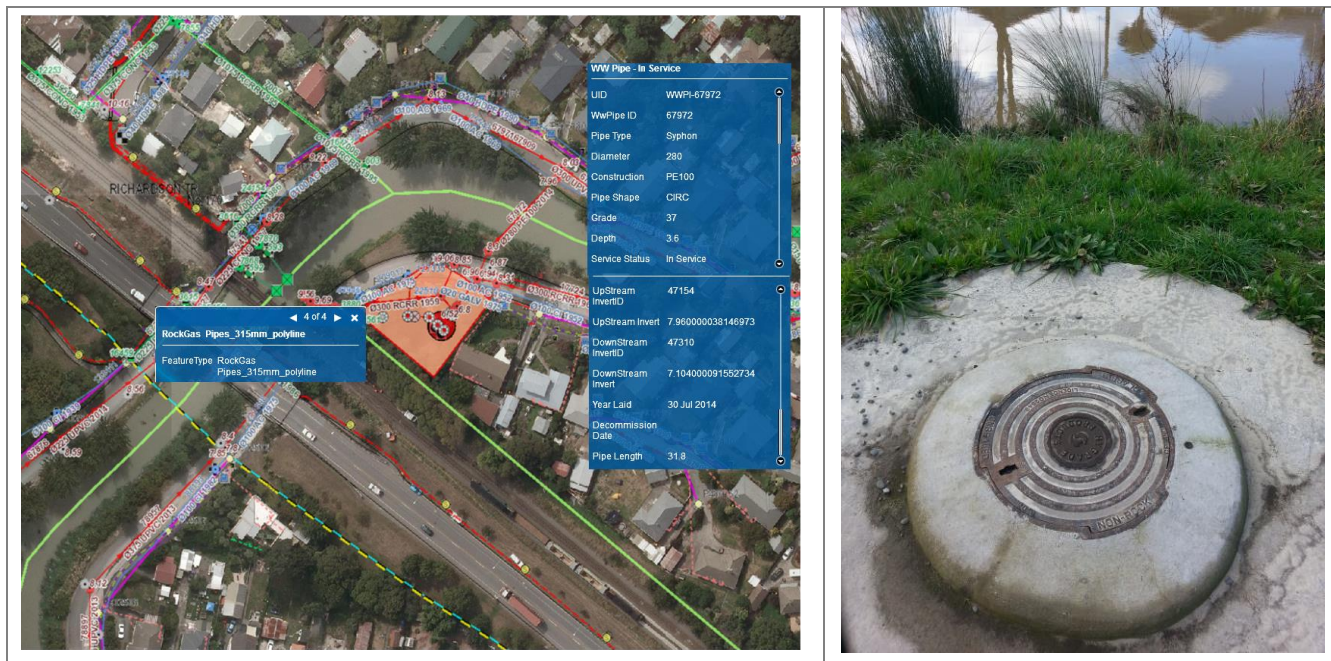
Potentially buried services cross the channel between Hansen Park and Radley Street. Photo of service cover on the right hand bank downstream of the railway bridge
